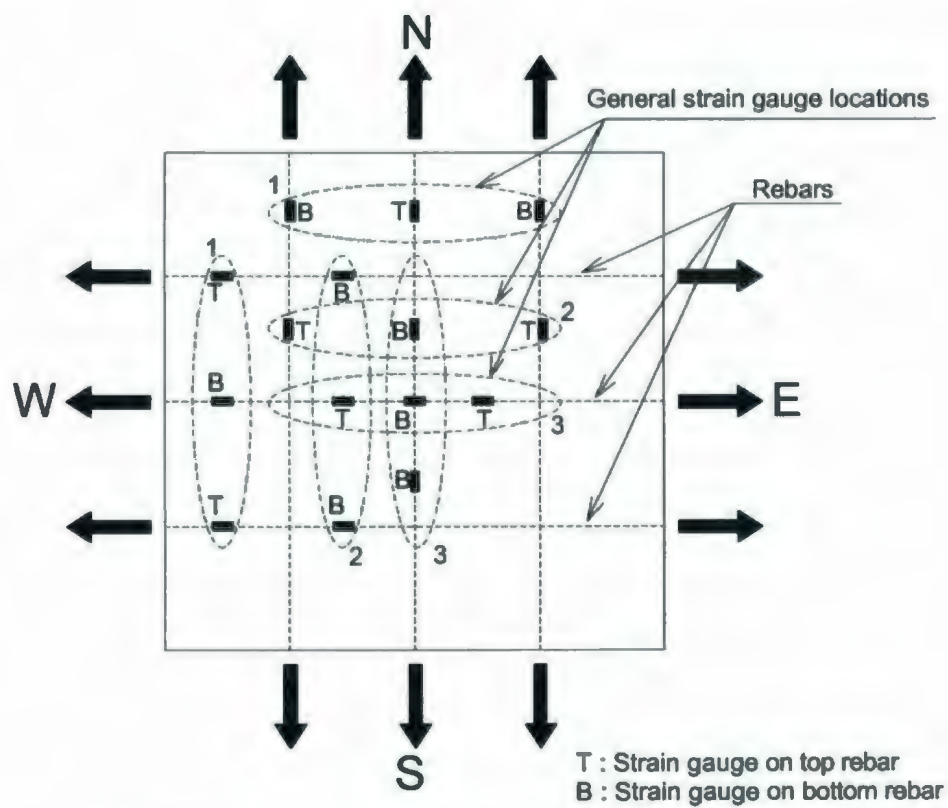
Typical locations of strain gauges mounted on the reinforcement
